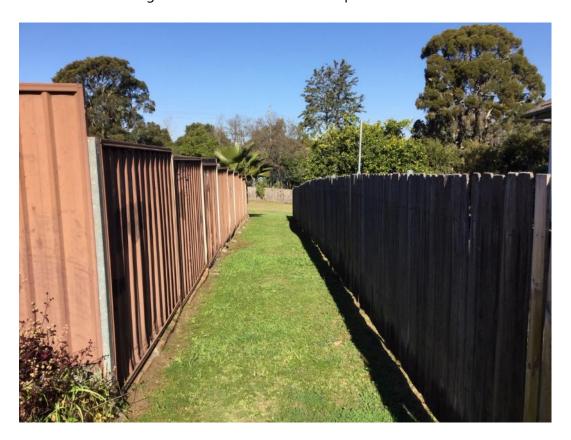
Looking north east towards the rear of 30 Champness Crescent
